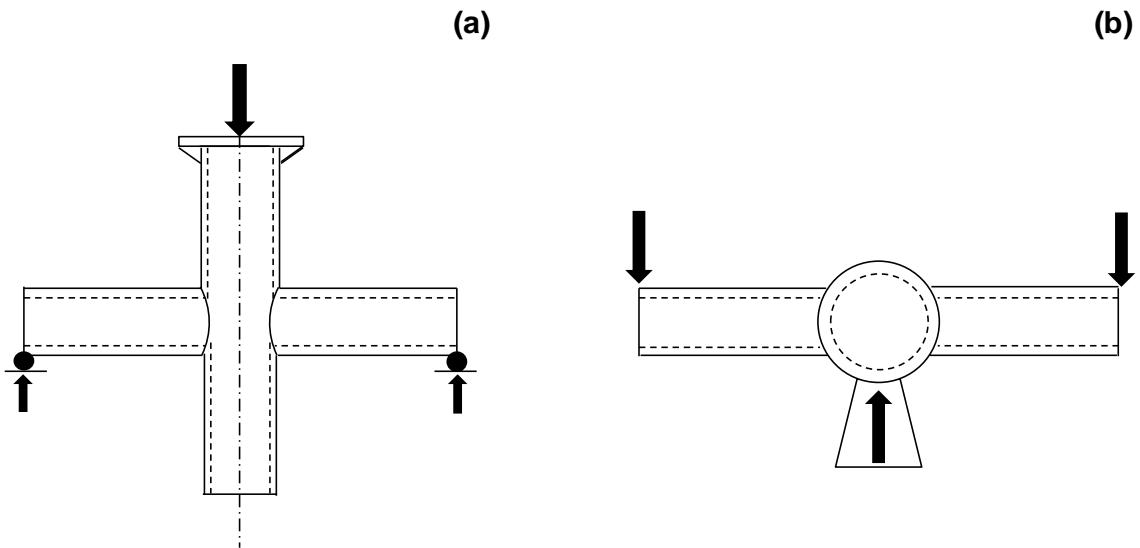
Loading condition (front view) for the X-joint in the experiment under: (a) in-plane bending (IPB) and (b) out-of-plane bending (OPB).
